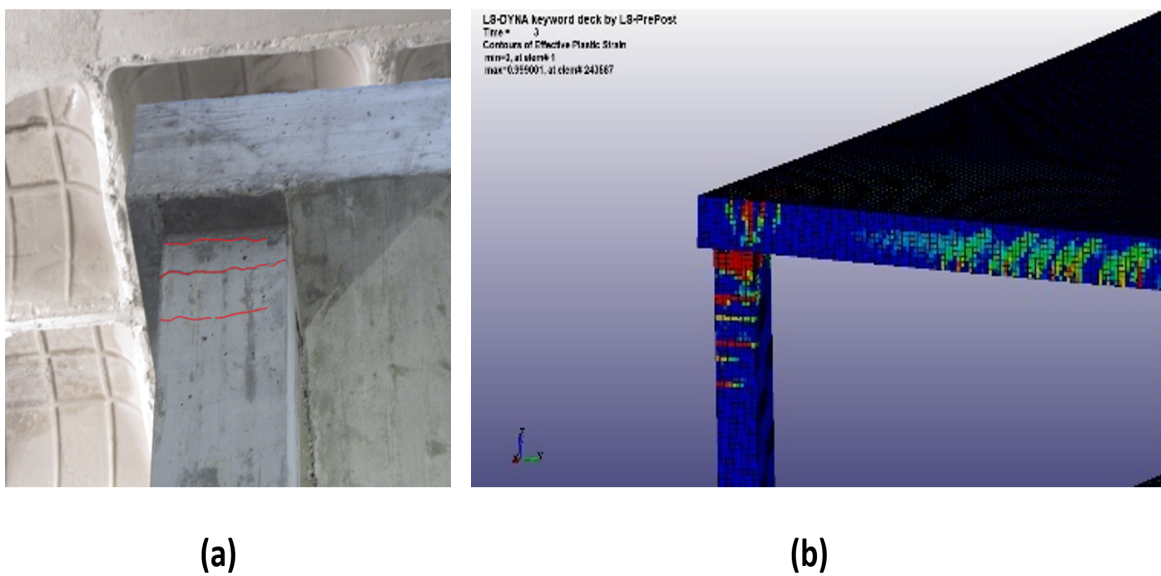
Test (a) and FEM (b) top slab crack pattern.
